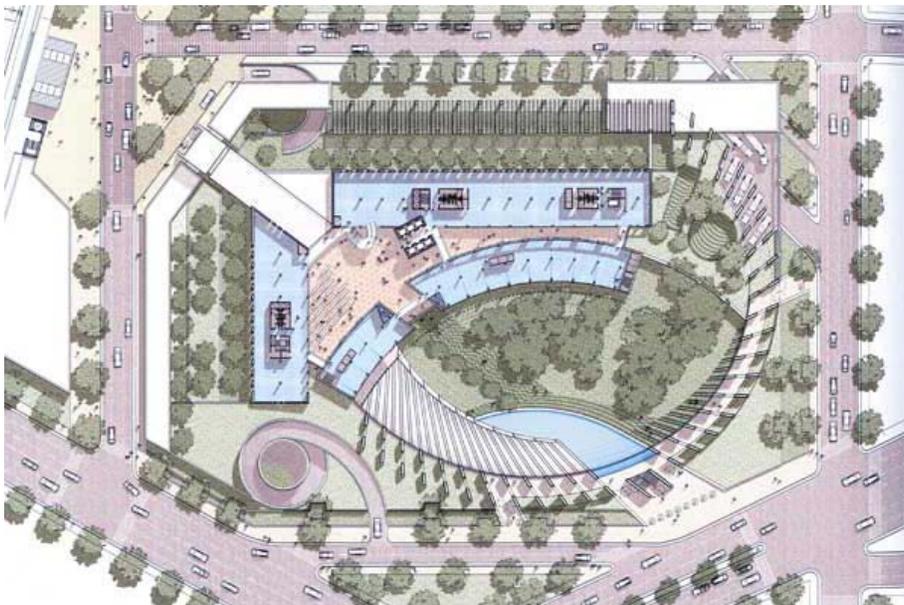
, Proposed Site Plan for New ATF Headquarters, Washington, D.C.
